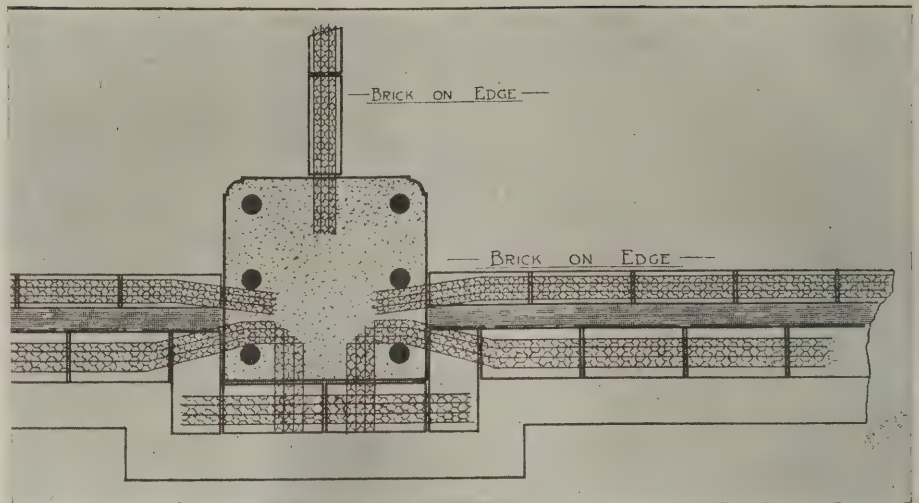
SECTIONAL PLAN OF REINFORCED CONCRETE COLUMN BONDED TO DOUBLE REINFORCED BRICK WALLS.
